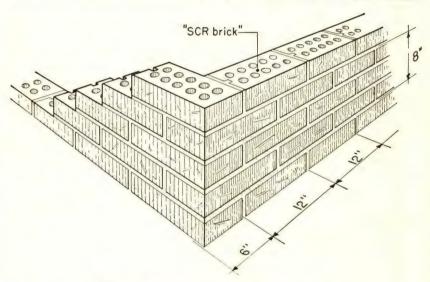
Simple Wall Construction with SCR Brick Courtesy of Structural Clay Products Institute
